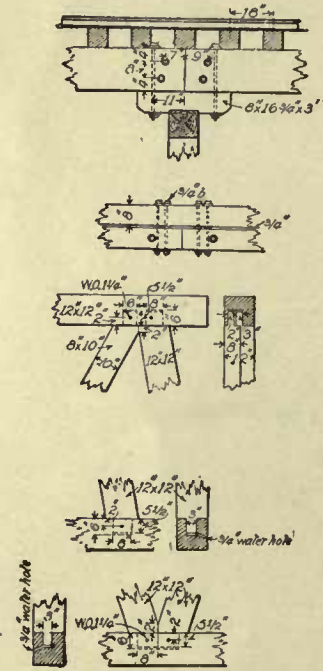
DETAILS OF STRINGER AND POST JOINTS.
